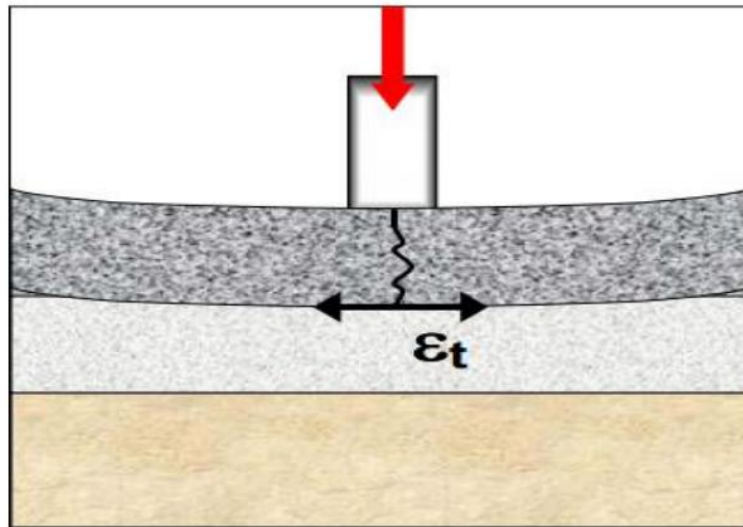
Fatigue cracking mechanism in pavement cross section schematic diagram [29]
